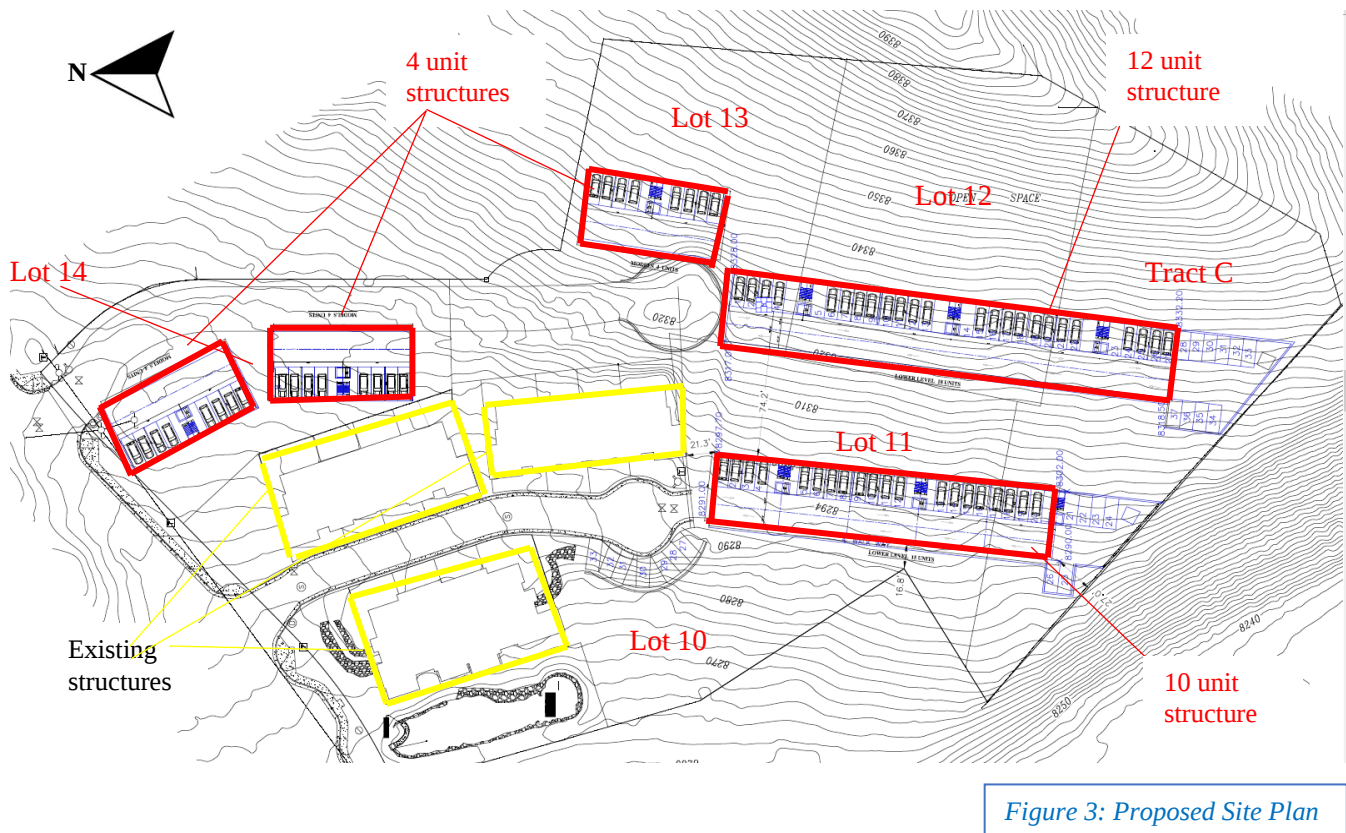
above is the applicant's proposed site plan. The structures outlined in yellow are the existing condominiums and the structures outlined in red represent the proposed condominium buildings. As seen in Figure 3, when looking at the topographical lines, the 10 and 12 unit structures located at the southern end of the site and the 4 unit structure to the east will experience the most elevation change thus requiring the variance. As also shown on the site plan, the 10 unit structure will be constructed at the end of the existing privately owned Elk Grove Lane cul-de-sac. The other proposed structures will require the extension of Aspen Grove Lane as a private street ending in a cul-de-sac. In order to accommodate the sloping topography of the site, the applicant as proposed a garage level on each building. The garages are proposed to be open on the front (west) side for parking access and the back (east) side will be constructed into the hillside. Vehicle access to the southern end of the 10 and 12 unit structures is by driving the entire length of the parking level that is the bottom story of the structure.
